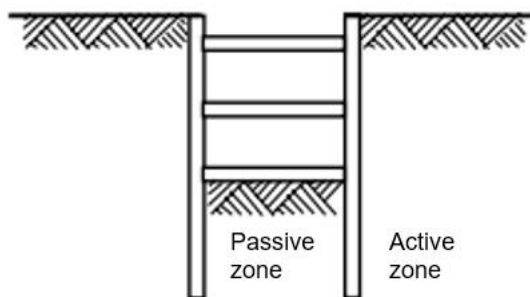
Schematic sketch of a braced excavation with double struts.
